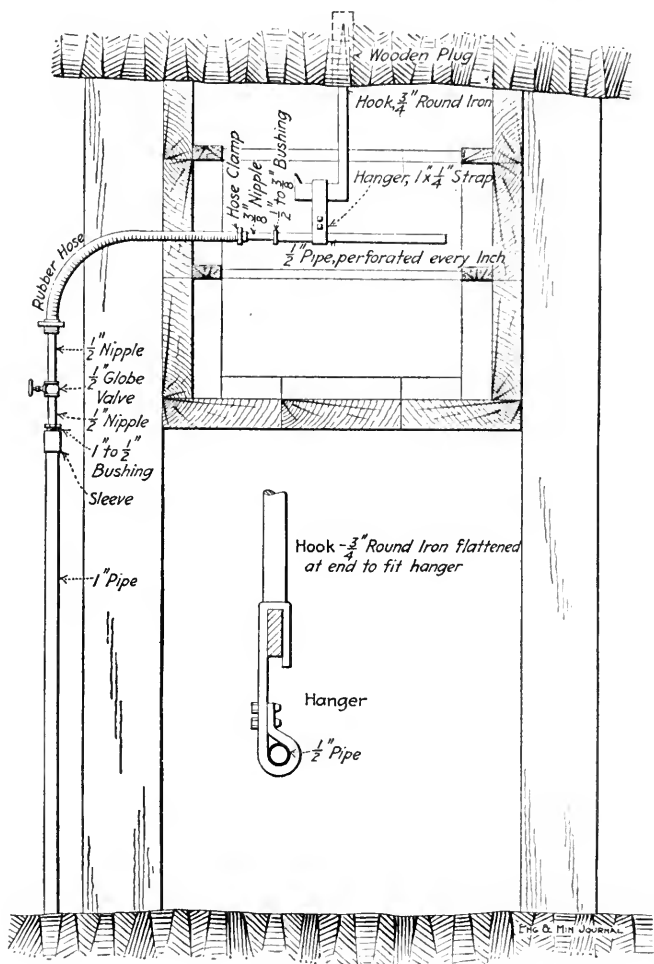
ARRANGEMENT OF SPRAY AT CHUTE MOUTH.
